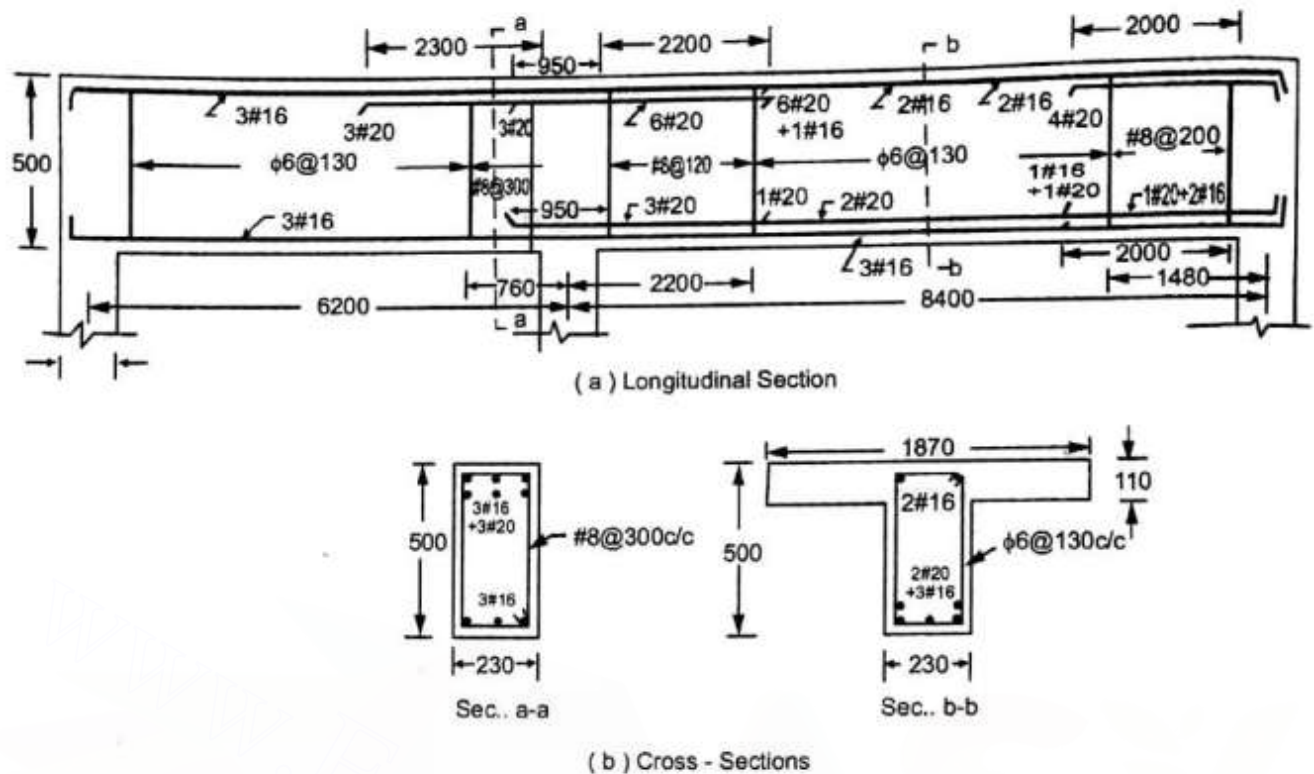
Details of Reinforcement of Transverse Beam ( Sect. 8.16.1)
